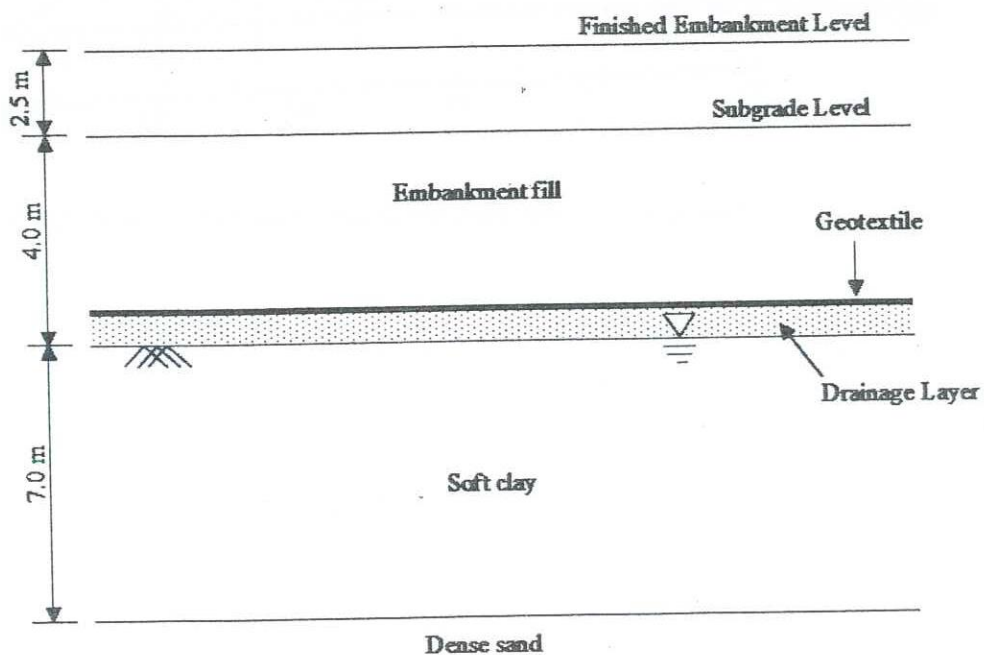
Cross section of the embankment with sub surface soil profile
